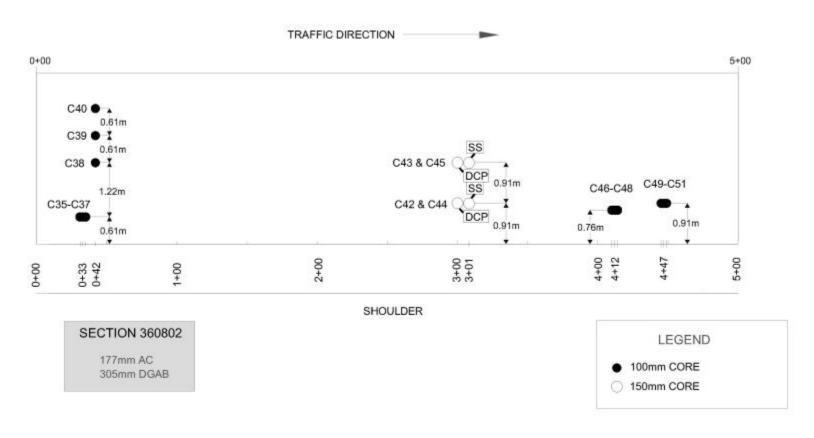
Layout of Sampling and Test Locations (May 21, 2008)
